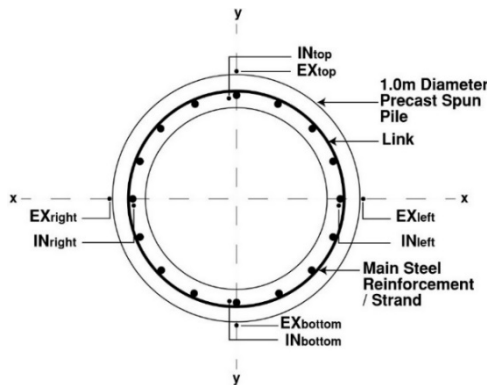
Instrumentation layout of fibre optic cables in spun-cast pile, Type A embedded cables as “IN” and surface mounted Type B cables as “EX”
